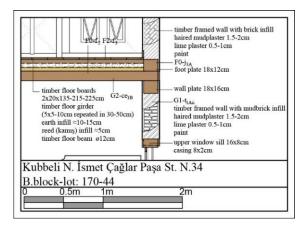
Connection detail 3, section drawing of floor beams located on the wall plate of lower floor wall and foot plate of upper floor wall located on the floor beams (Kılıç N. b.block-lot: 170-44)
